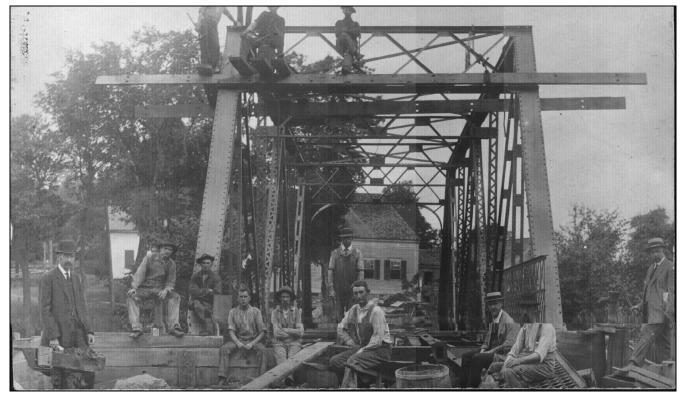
Existing steel truss bridge (Wentworth 148/121) shown under construction in 1909 (Source: Wentworth Town Scrap Book).
